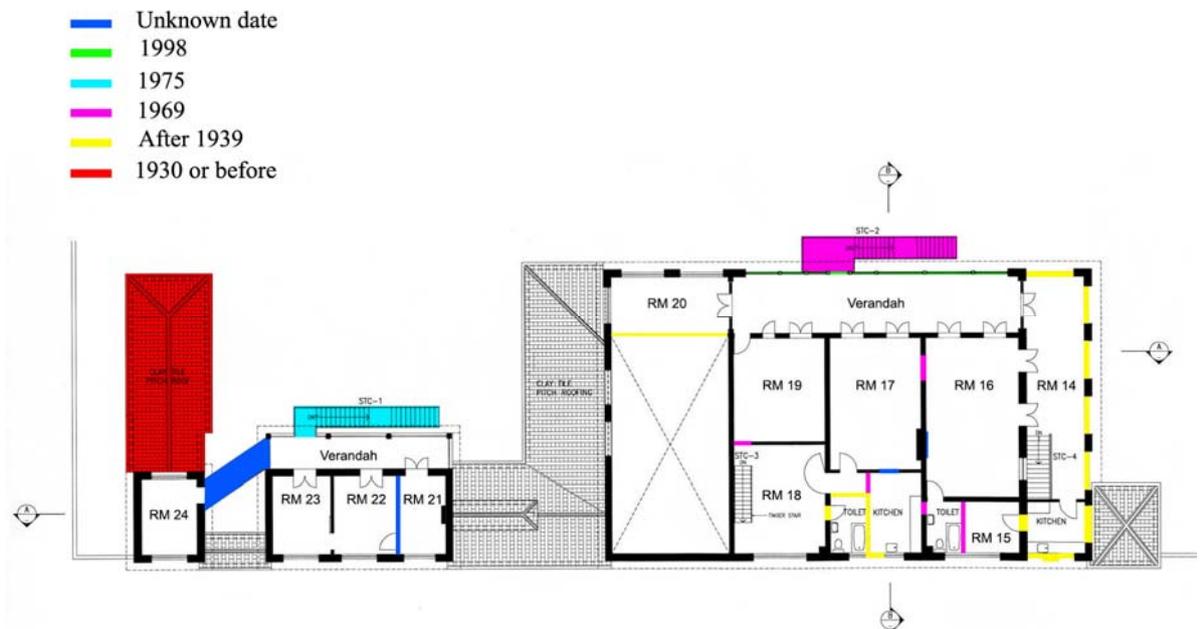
Existing first floor plan of the former clubhouse at No. 12 Oil Street, North Point highlighted with changes during different possible periods.
